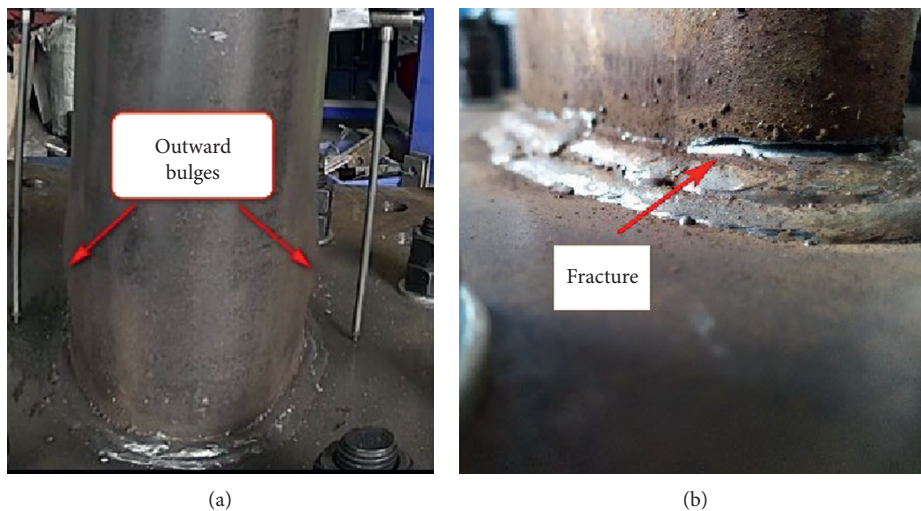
Typical failure modes of the specimens. (a) Local buckling. (b) Fracture of the steel tube.
